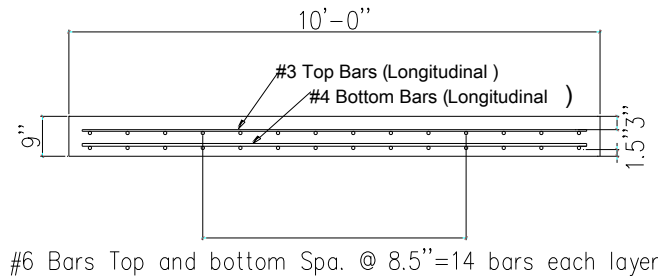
Deck Reinforcement Detail 1 (Test units 1, 2, and 4)
